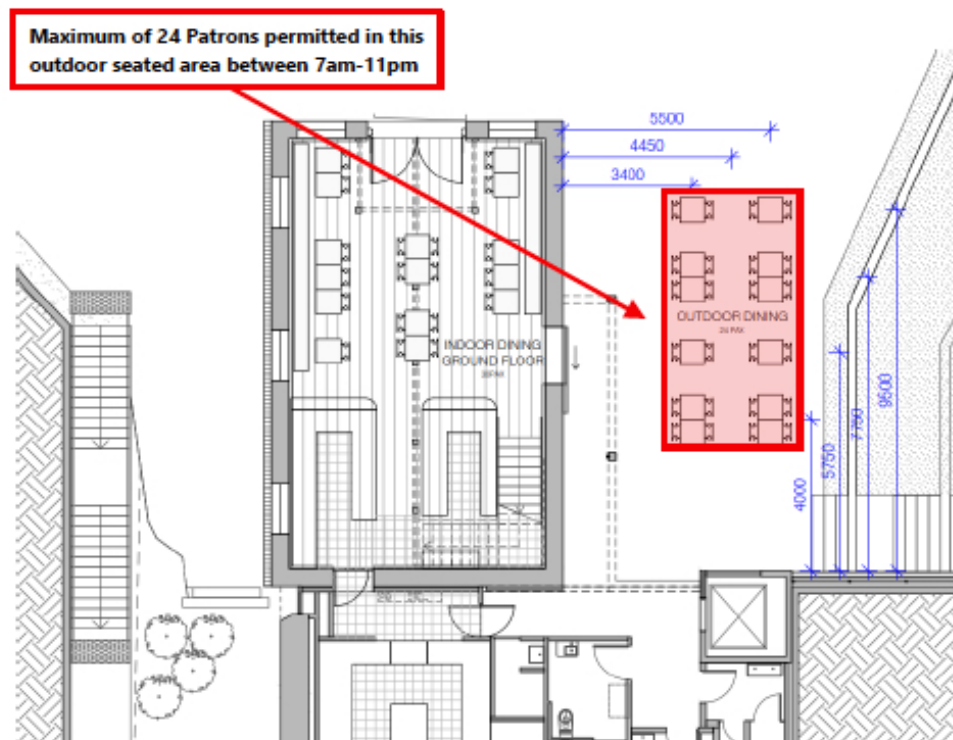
Restrictions for Ground Floor Outdoor Seating Area
